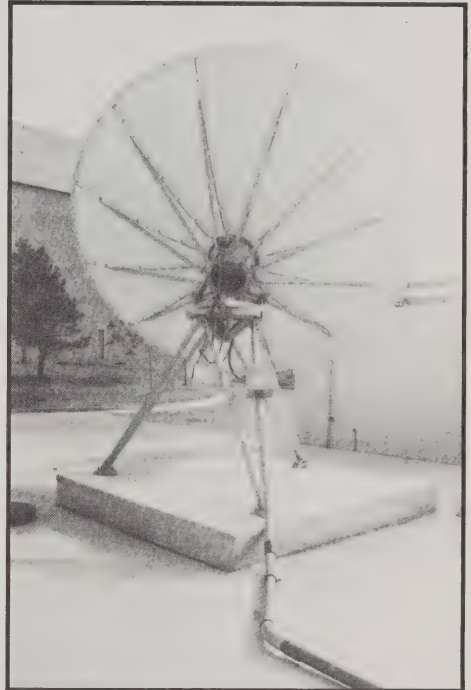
An Unusual Pad Support. *This pad support, in the mountains of Colorado, was built onto a large granite rock overlooking a hill. A jackhammer was used to insert rebar and J-bolts into the granite base in order to set the foundation. Over 3 cubic yards of concrete were used. Then a hammerdrill was used to make holes for redheads. The dish was assembled piece by piece onto the mount. An aerial run of messengered cable, cable supported by a strong guy wire, spanned 300 feet in the air from the dish to the customer's home across a gully. Since the installation was completed this dish has been struck twice by lightning!
